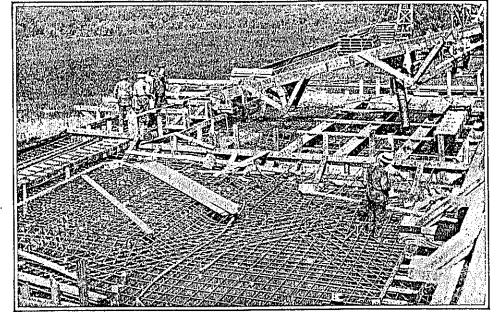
(BELOW) CONCRET-ING THE FLOOR SLAB Wood chute with drop pipes delivers concrete in place. Note heavy reinforcement.
